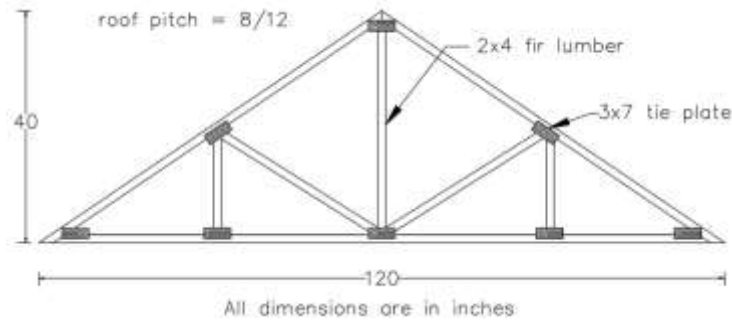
Howe type pitched roof truss to support steep sloped roof
